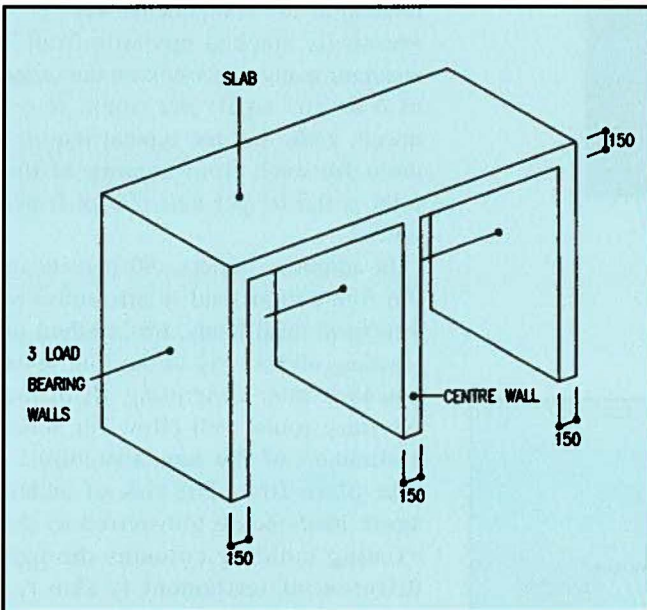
System 2 basic M Volumetric consisting of three walls with linking slab element.
